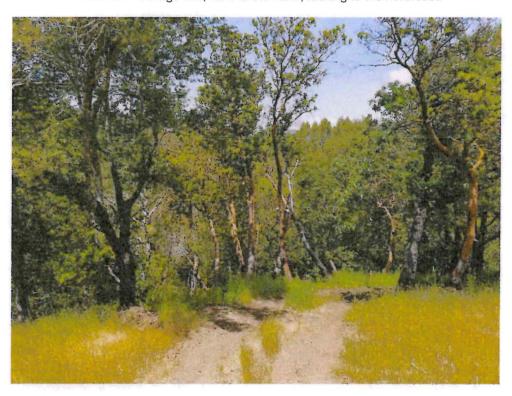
Garage site, view from the garage back down the driveway. ADU is to the left.
